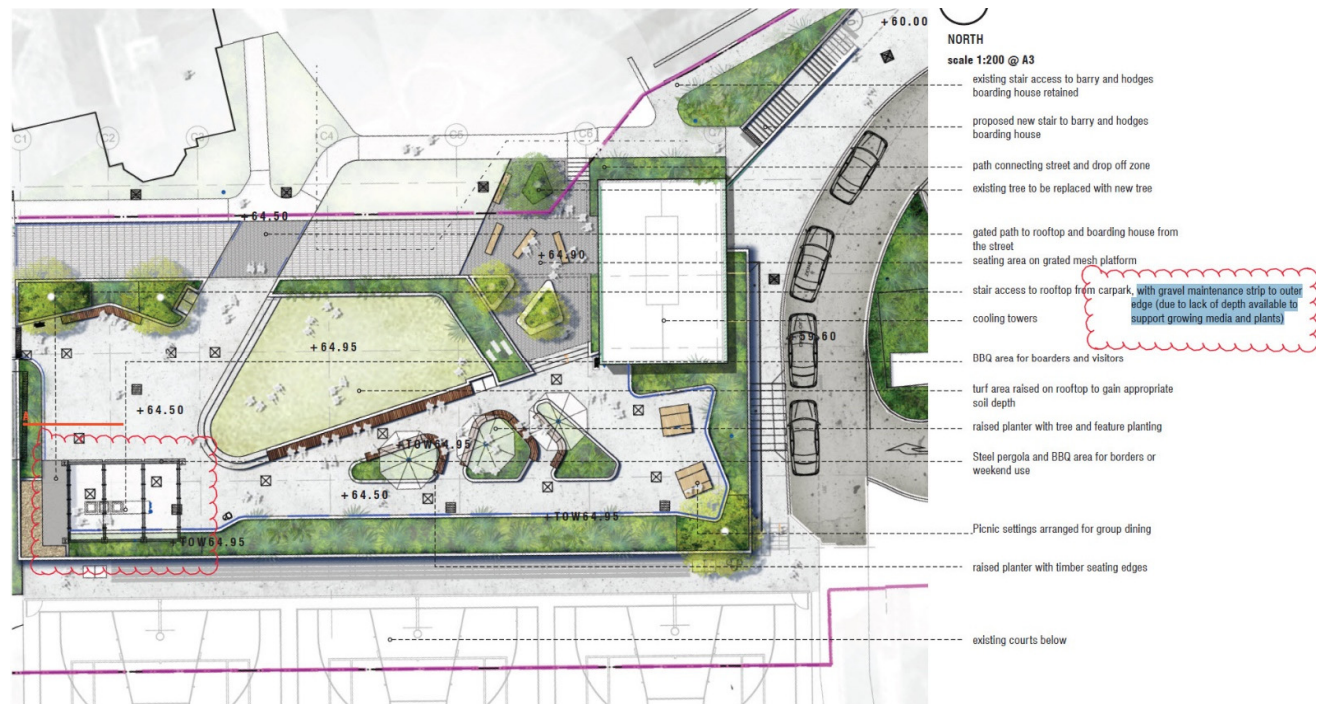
PROPOSED Bishopsgate car park roof terrace: Landscape Design (Source: Oculus, Revised Masterplan Concept Plan - Section 4.55 Submission, page 20)
